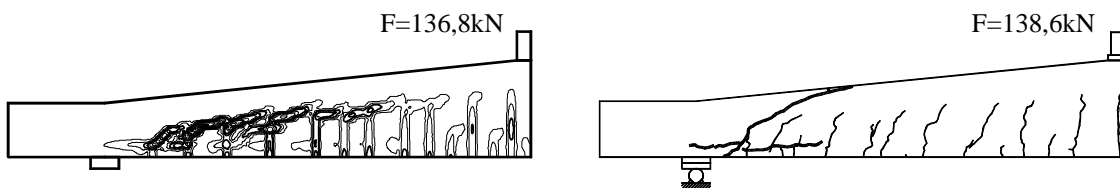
Crack propagation at failure of test beam 3L2 from Non-FEM and test
